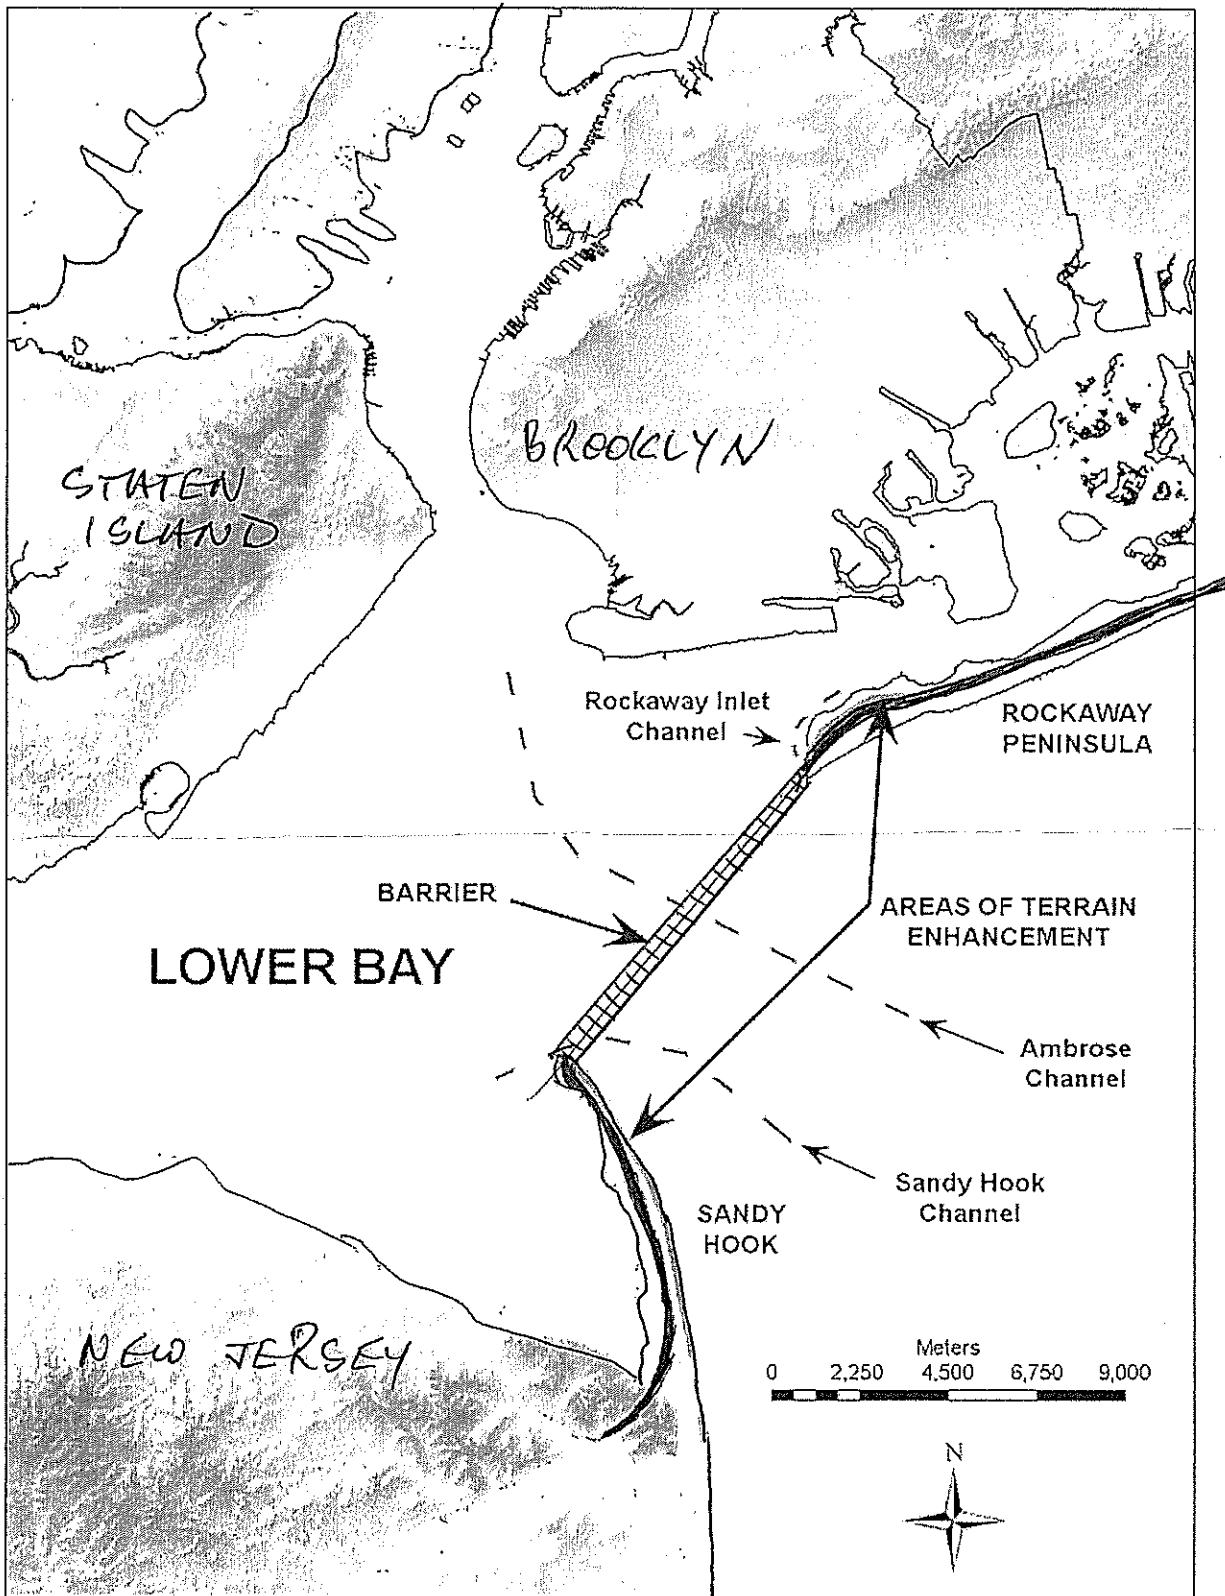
Proposed Outer Harbor storm surge barrier would protect southern Brooklyn and Queens, plus provide a road/rail link between northern New Jersey and Long Island /JFK airport. Courtesy Halcrow, Inc.
